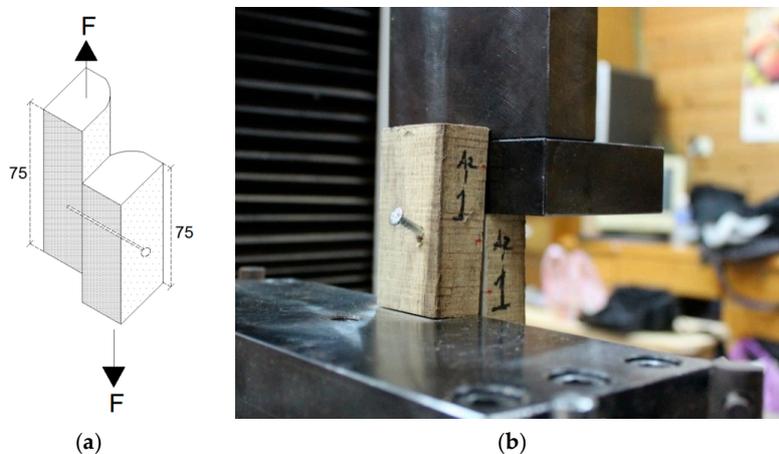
Shear load testing (unit: mm). (a) load direction, (b) testing setup.
